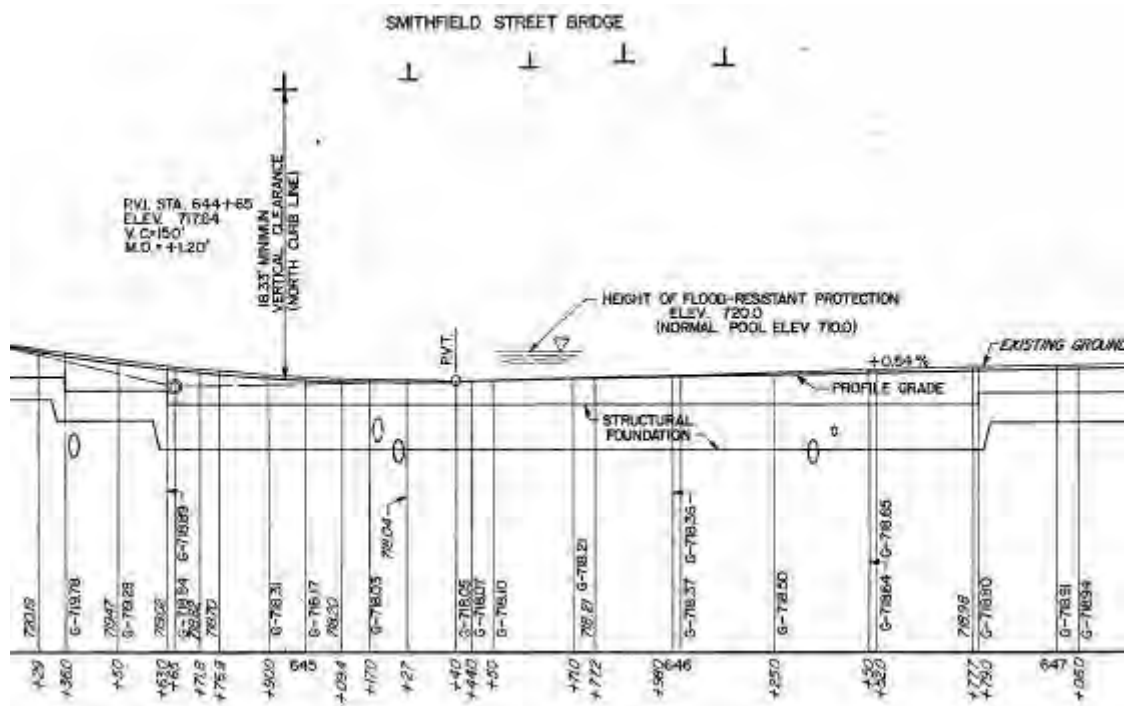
Ramp D Profile at Smithfield Street Bridge
